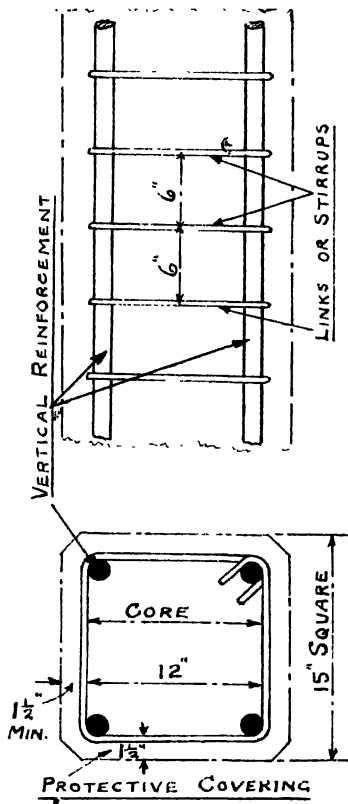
COLUMN REINFORCEMENT (LINK TYPE)
